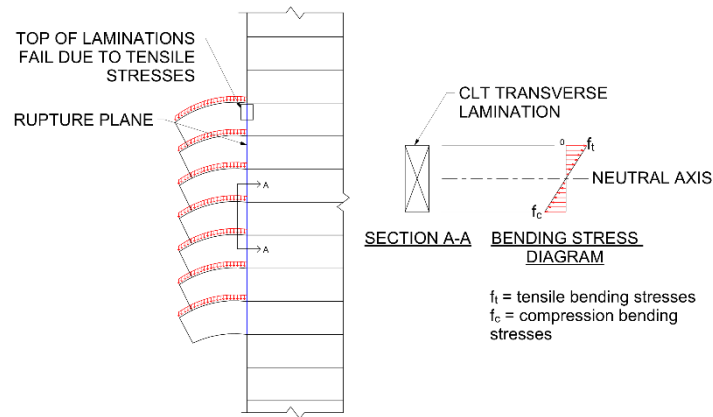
Bending due to tension in face lamination of CLT floor panel
